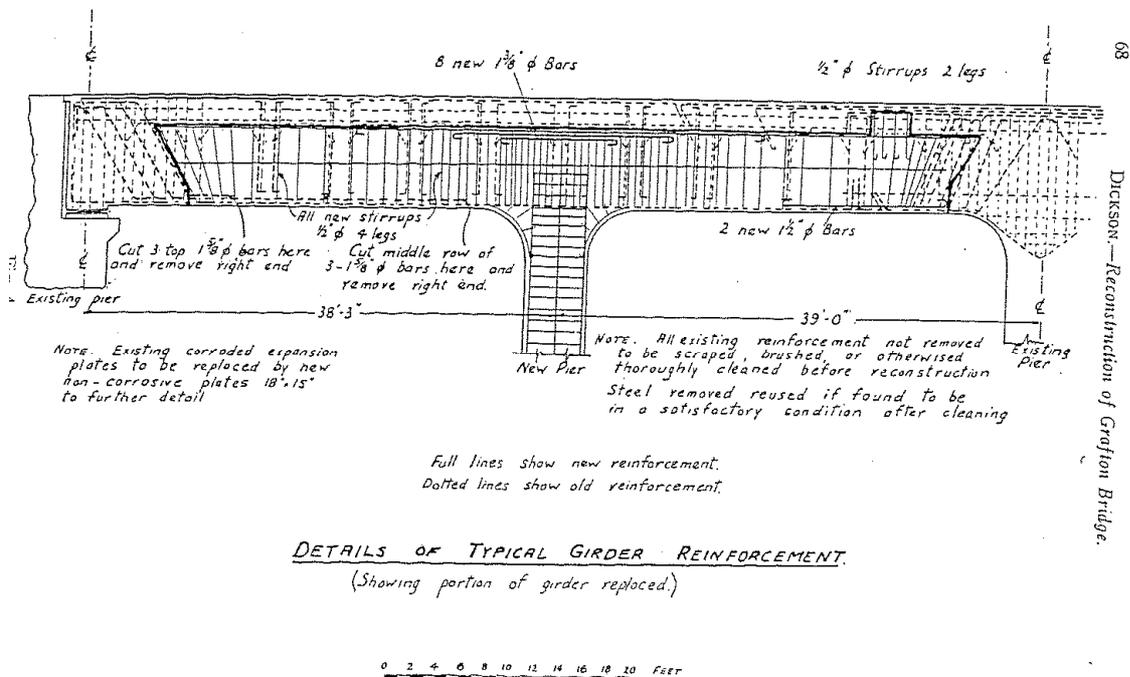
1936 Reconstruction Drawing of New Pier and Replacement Beams
